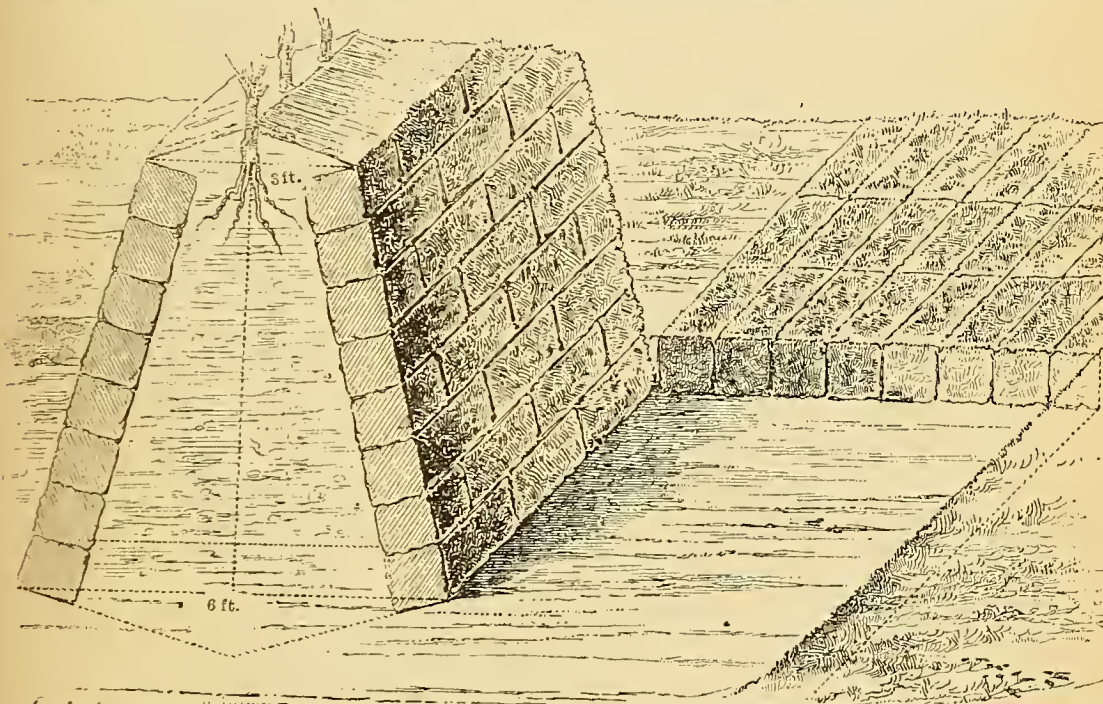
SECTIONAL ELEVATION OF TURF HEDGE, SHOWING HOW TO JOINT THE TURFS, BUILD AND FILL THE HEDGE AND PLANT IT, AND ALSO HOW TO MARK OUT AND CUT THE TURFS.
